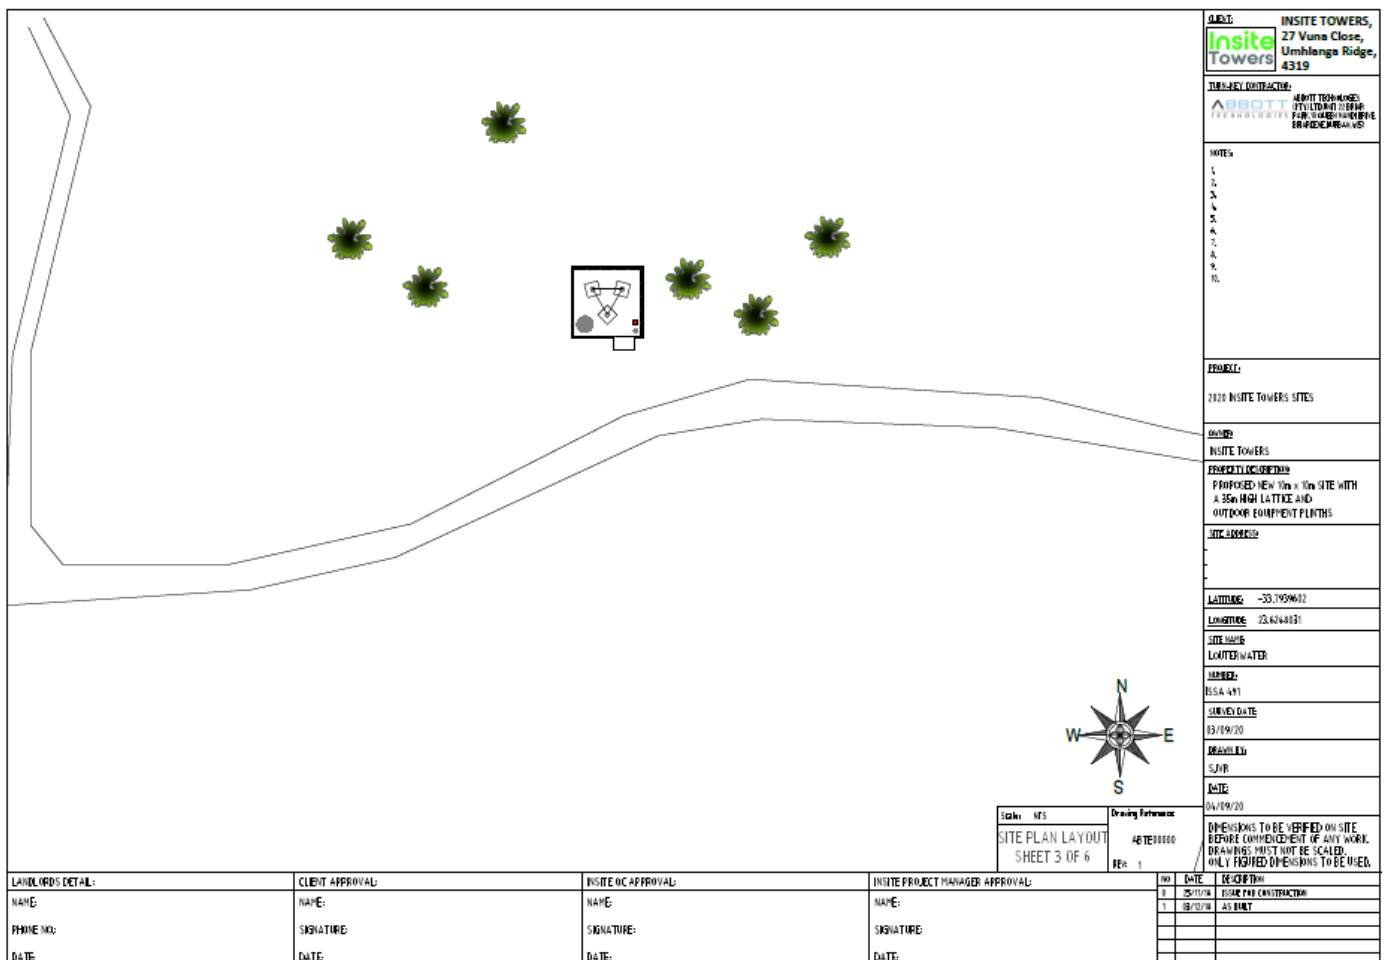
Floor plan of the proposed Louerwater telecommunication mast
